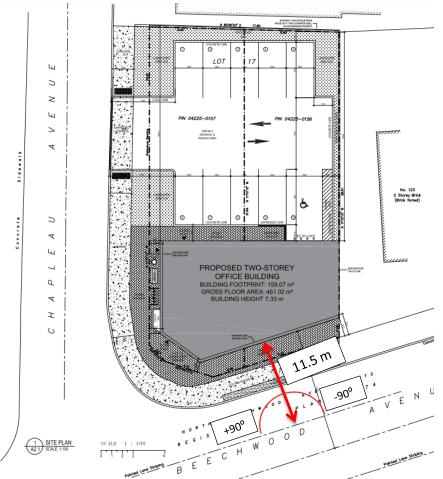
Site plan of proposed commercial building at the Corner of Chapleau and Beechwood
